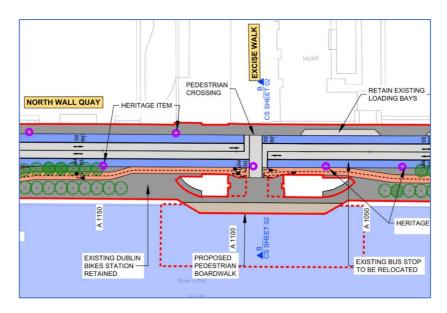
Proposed Layout on North Wall Quay with Proposed Boardwalk on the River Side
